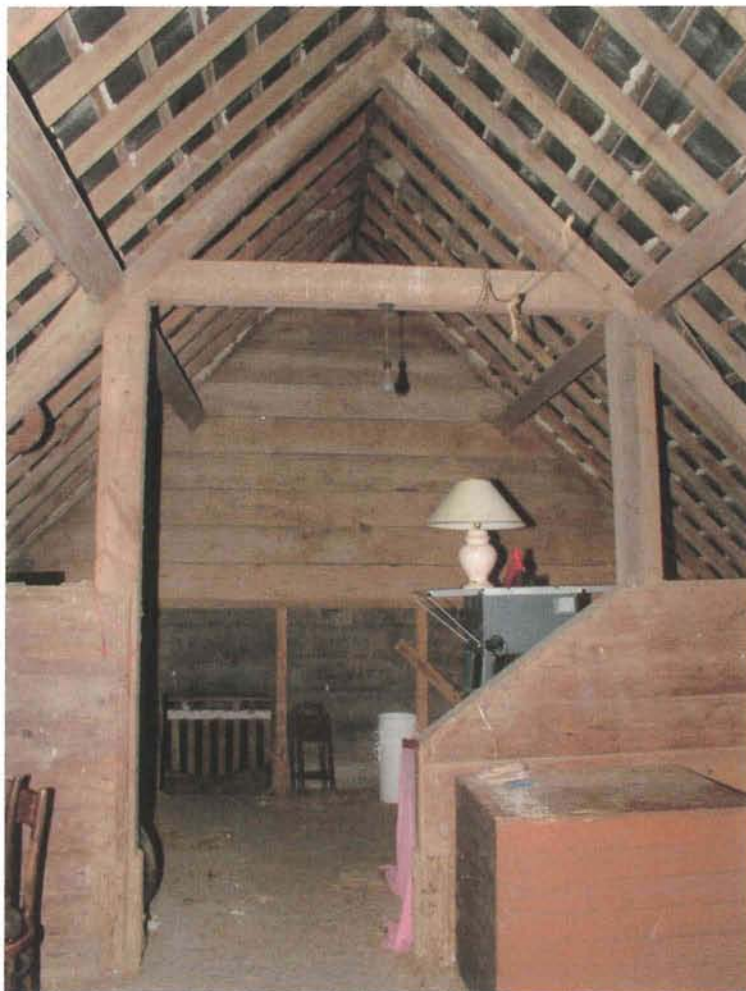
First floor of stable building showing Truss 3 and partitions. Photo CPAT 2091-014
